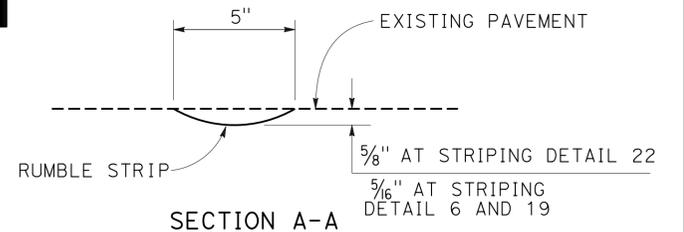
STRIPING WITH CENTERLINE RUMBLE STRIP (CRS) GROUND-IN INDENTATIONS
